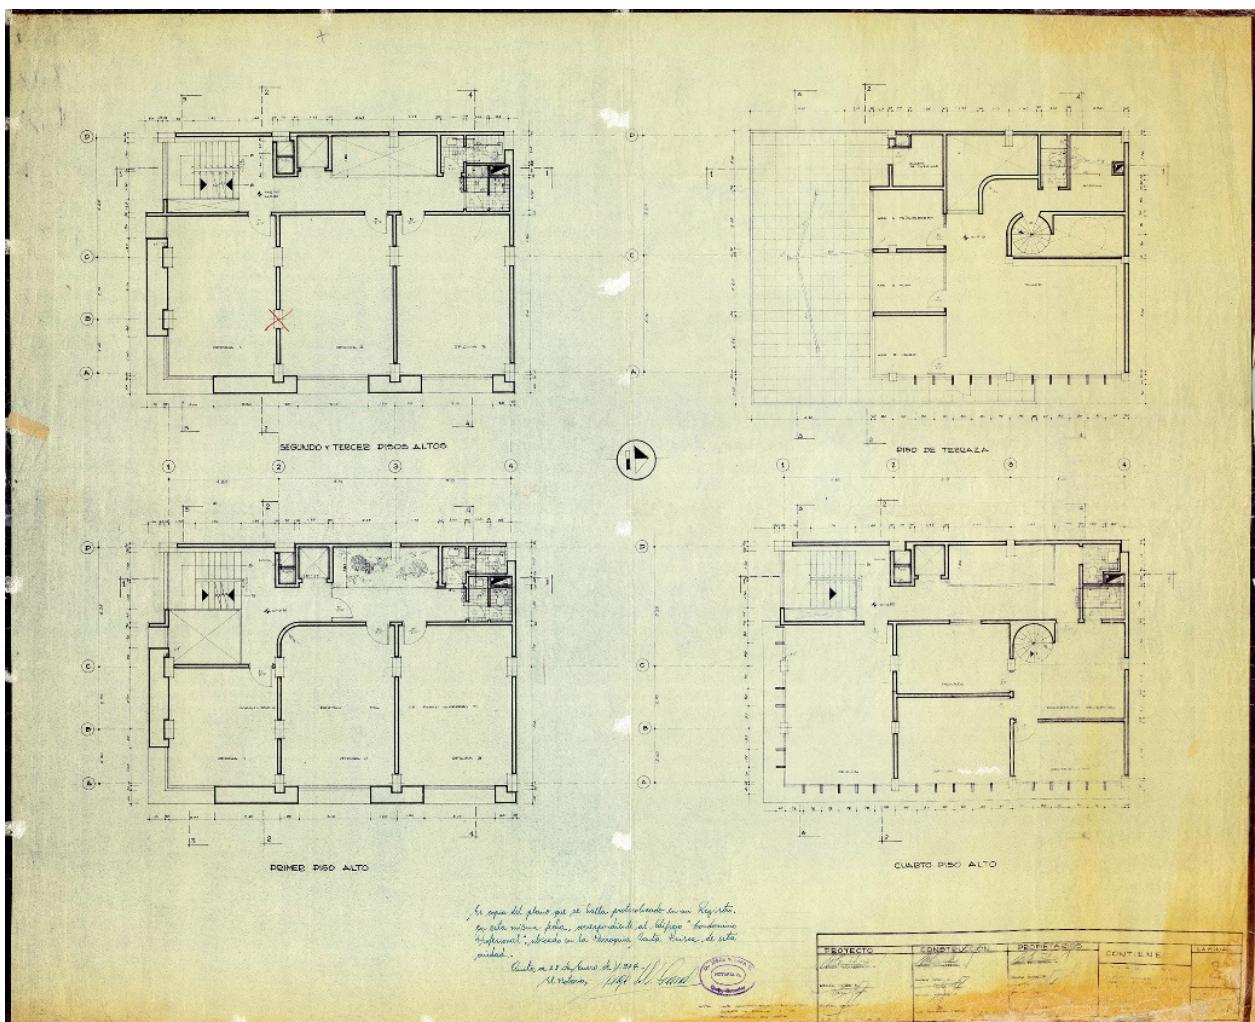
Plan N°2 of the Condominio Profesional building. The original notarised and architectural plans are for the first, second, and third floors, fourth floors, terrace floors, and Esc. 1/50. (Source: Archive Andrés Peñaherrera Mateus).
